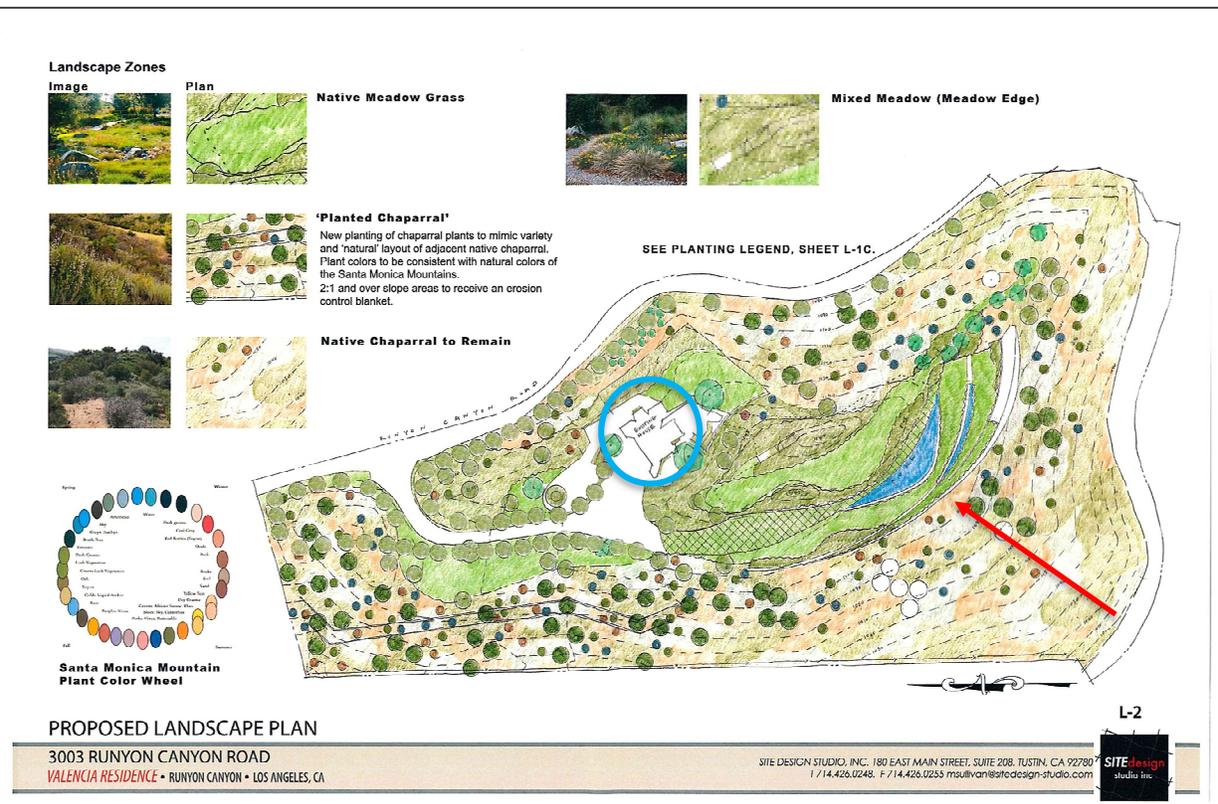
Sketch of proposed landscape plan showing sloping hillsides where new primary residence (red arrow) will be located in relation to historic residence (blue circle) (Source: landscape 2016-10-10, Page 07)
